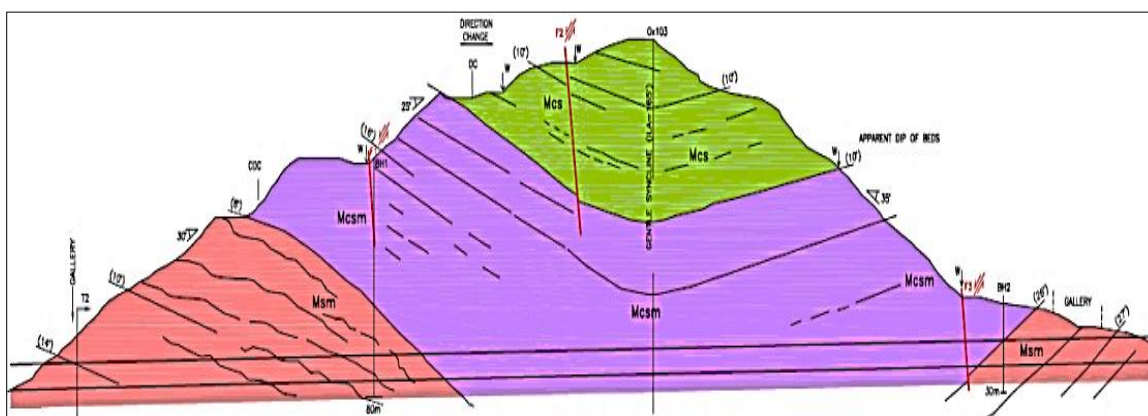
First section of the corridor of Ardabil-Mianeh railway tunnel
